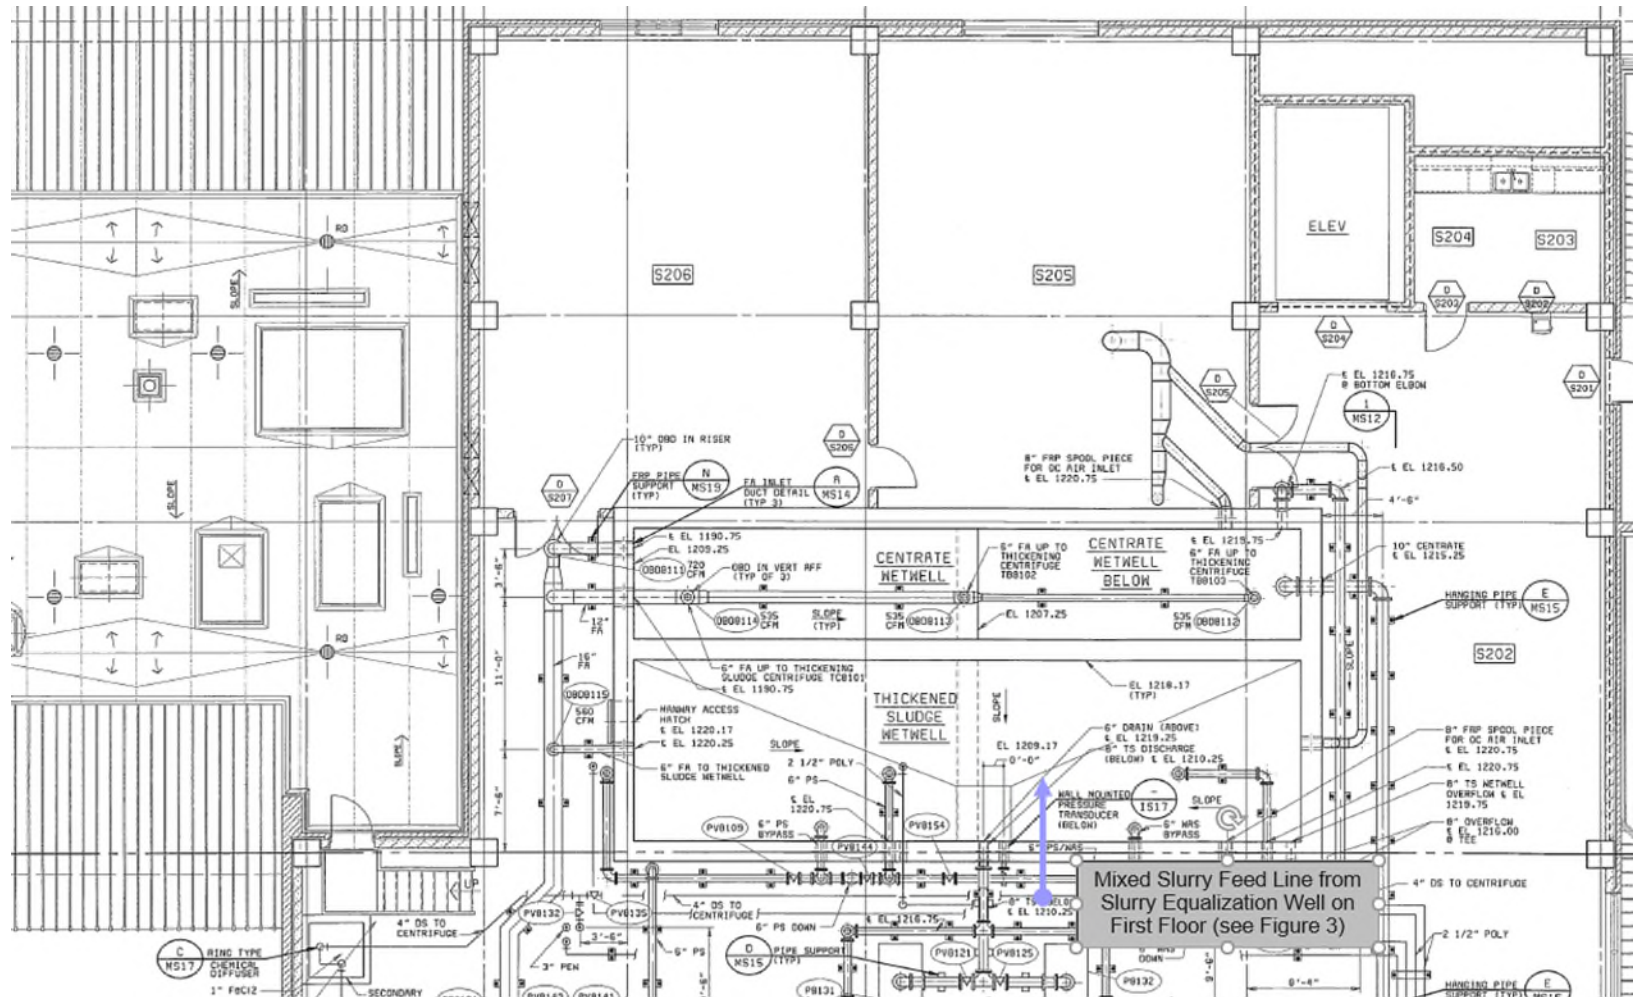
Direct Equalization Tank Feed Alternative: Mixed HSW Organic Slurry Transfer to Digester Control Building Layout (Solids Building, First Floor)
